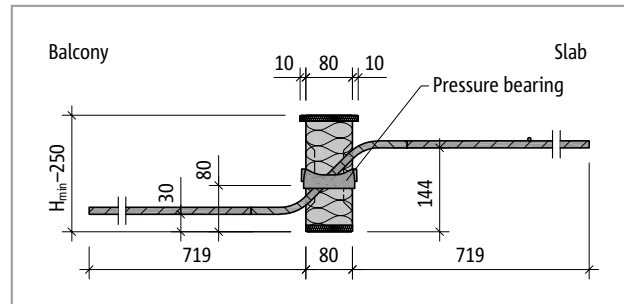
Schöck Isokorb® T type Q-V9 to Q-V11: Product section
